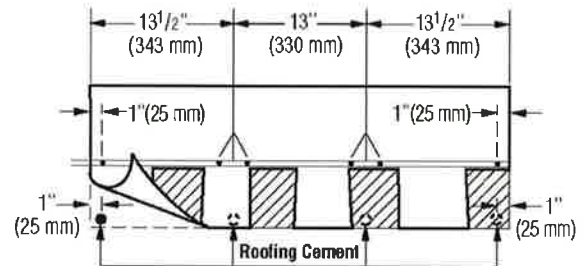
Use six nails and four spots of asphalt roofing cement on steep slopes.
